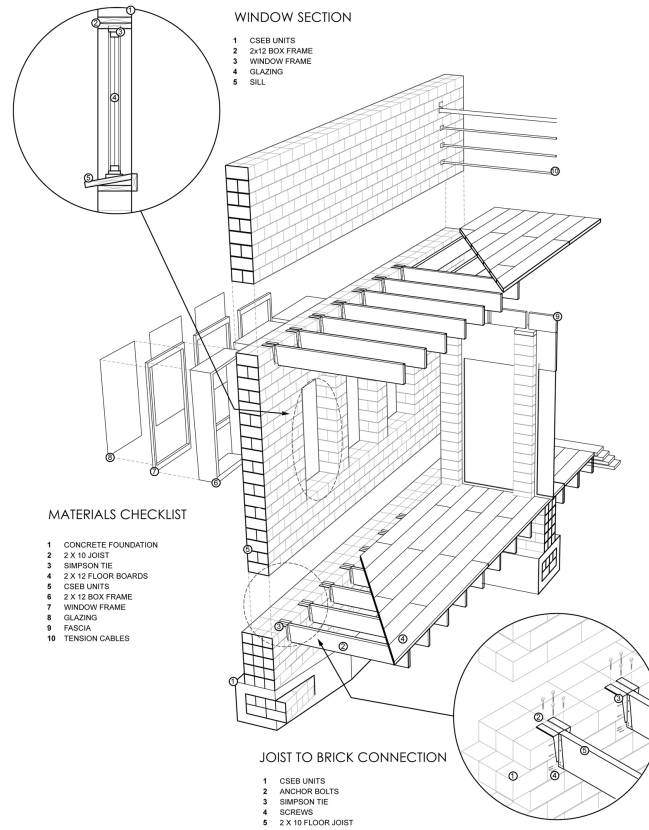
Housing prototype typical foundation, floor, wall, roof, and opening assemblies. Source: (Author)
